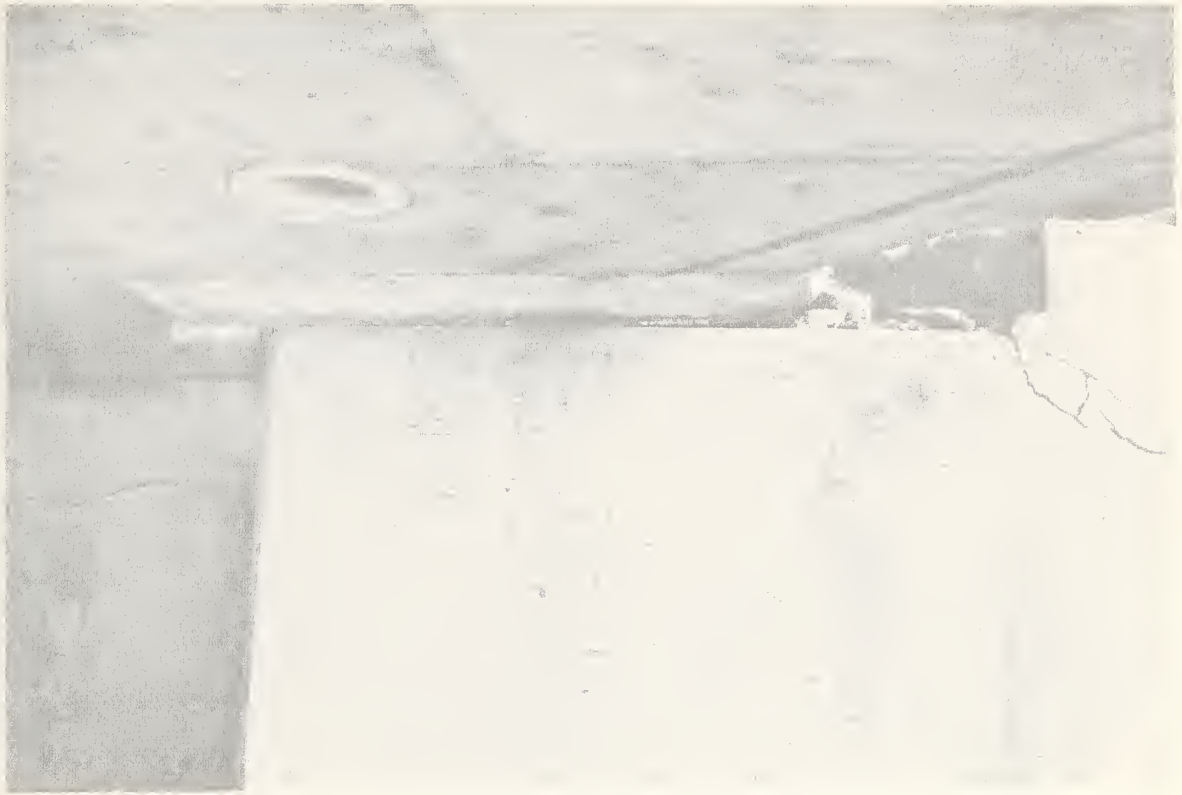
View showing horizontal displacement of bridge deck on its support - San Fernando Road Overhead
